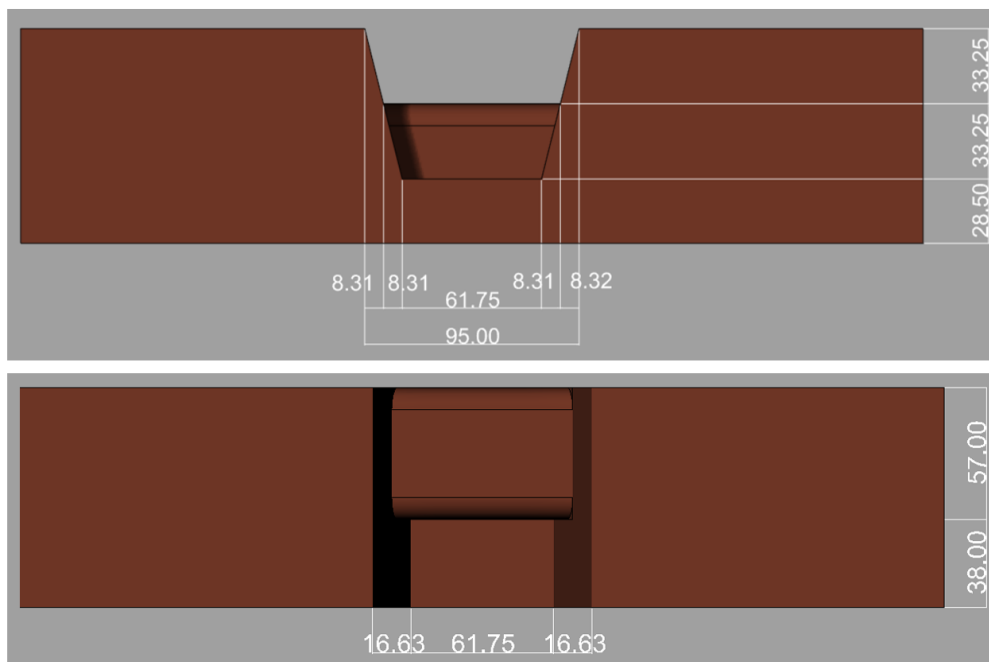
Dimensions of Beam 2 at the location of the connection
